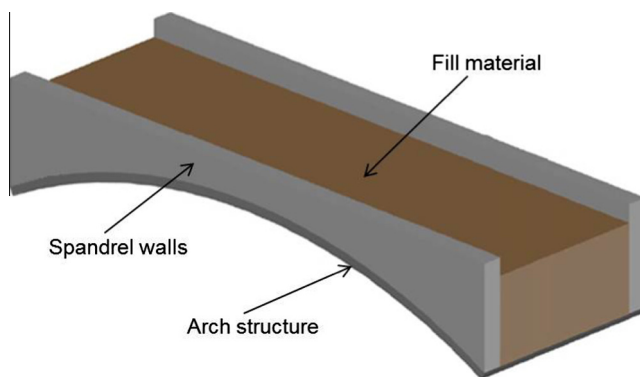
Typical closed-spandrel arch bridge construction with arch structure, fill material, and spandrel walls to retain the fill.
